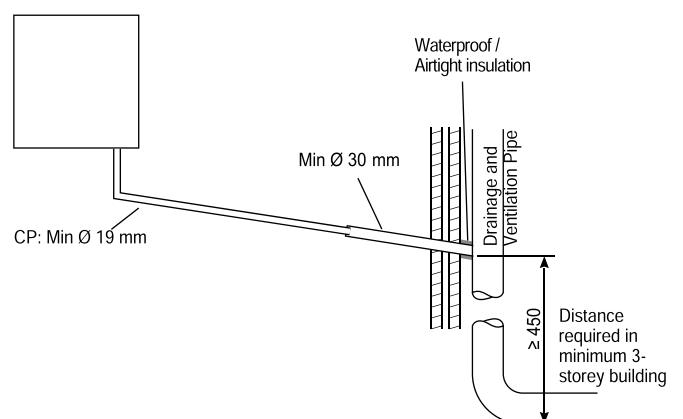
Connection of Condensation Drainage to Drainage and Ventilation Pipe
